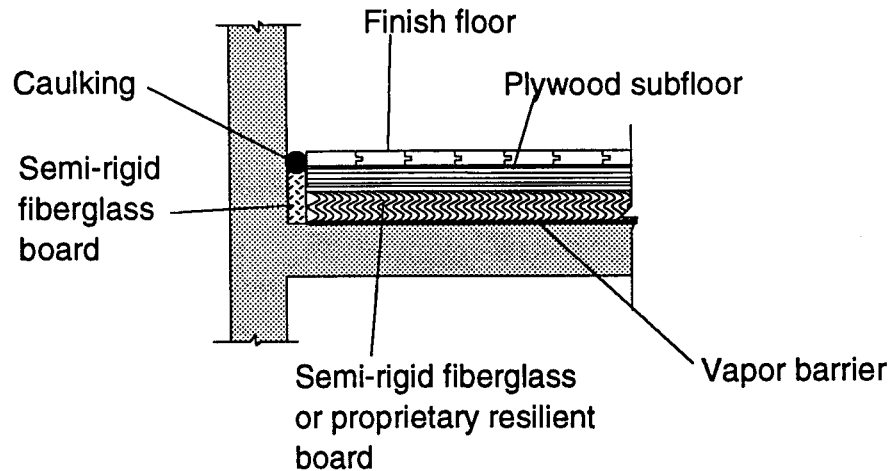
Example of lightweight wood floating floor supported on a resilient mat. The floating slab should not be in contact with the main building structure nor the structural slab below. The floating slab could be formed from layers of plywood glued together to form a continuous slab.
